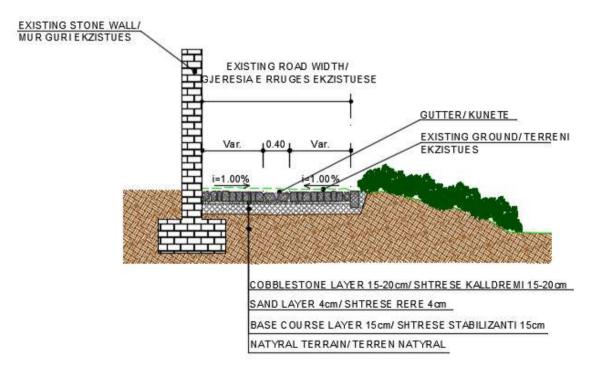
Typical Cross Section (Type 1 – New Cobblestone)
